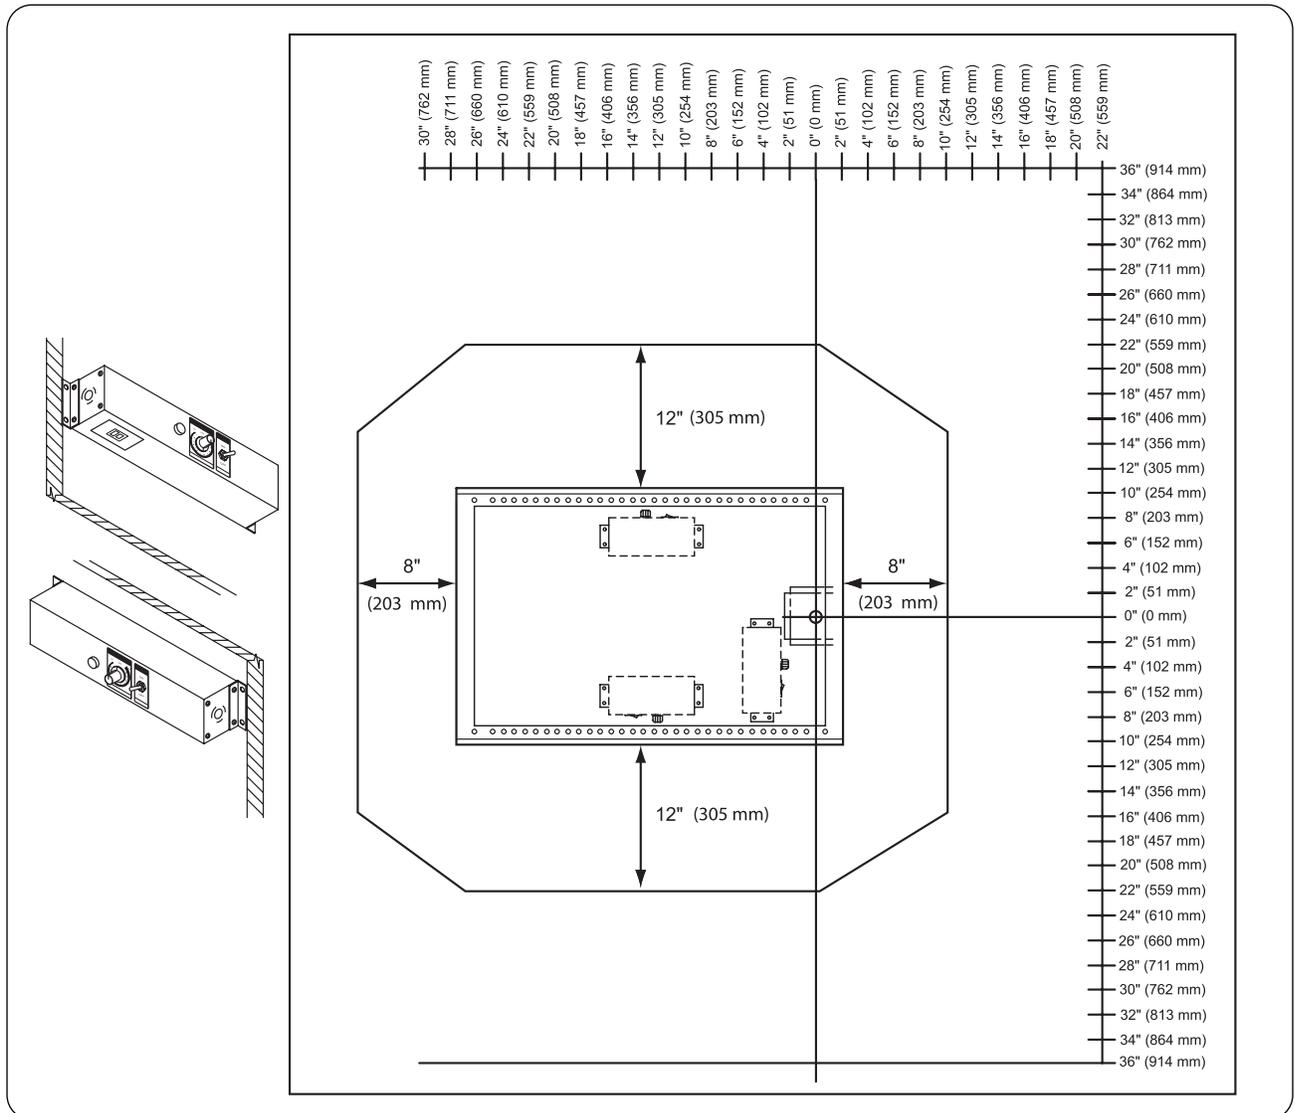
Minimum Remote Mounting Distance for Remote Control Box
